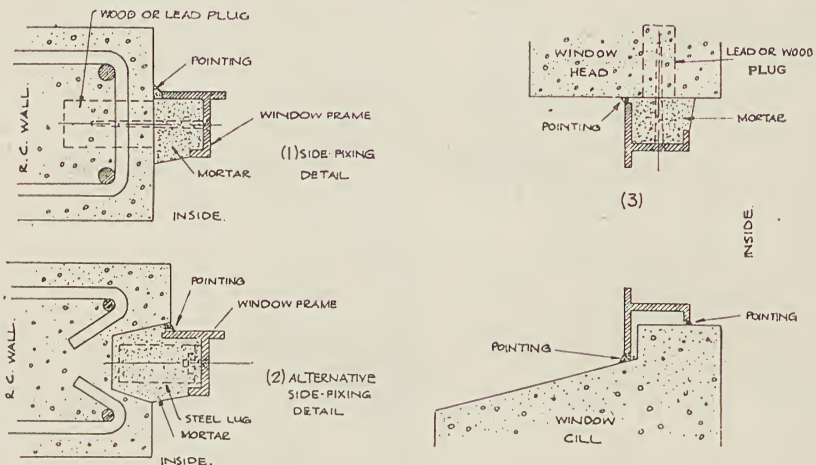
FIXING STEEL WINDOW FRAMES.
